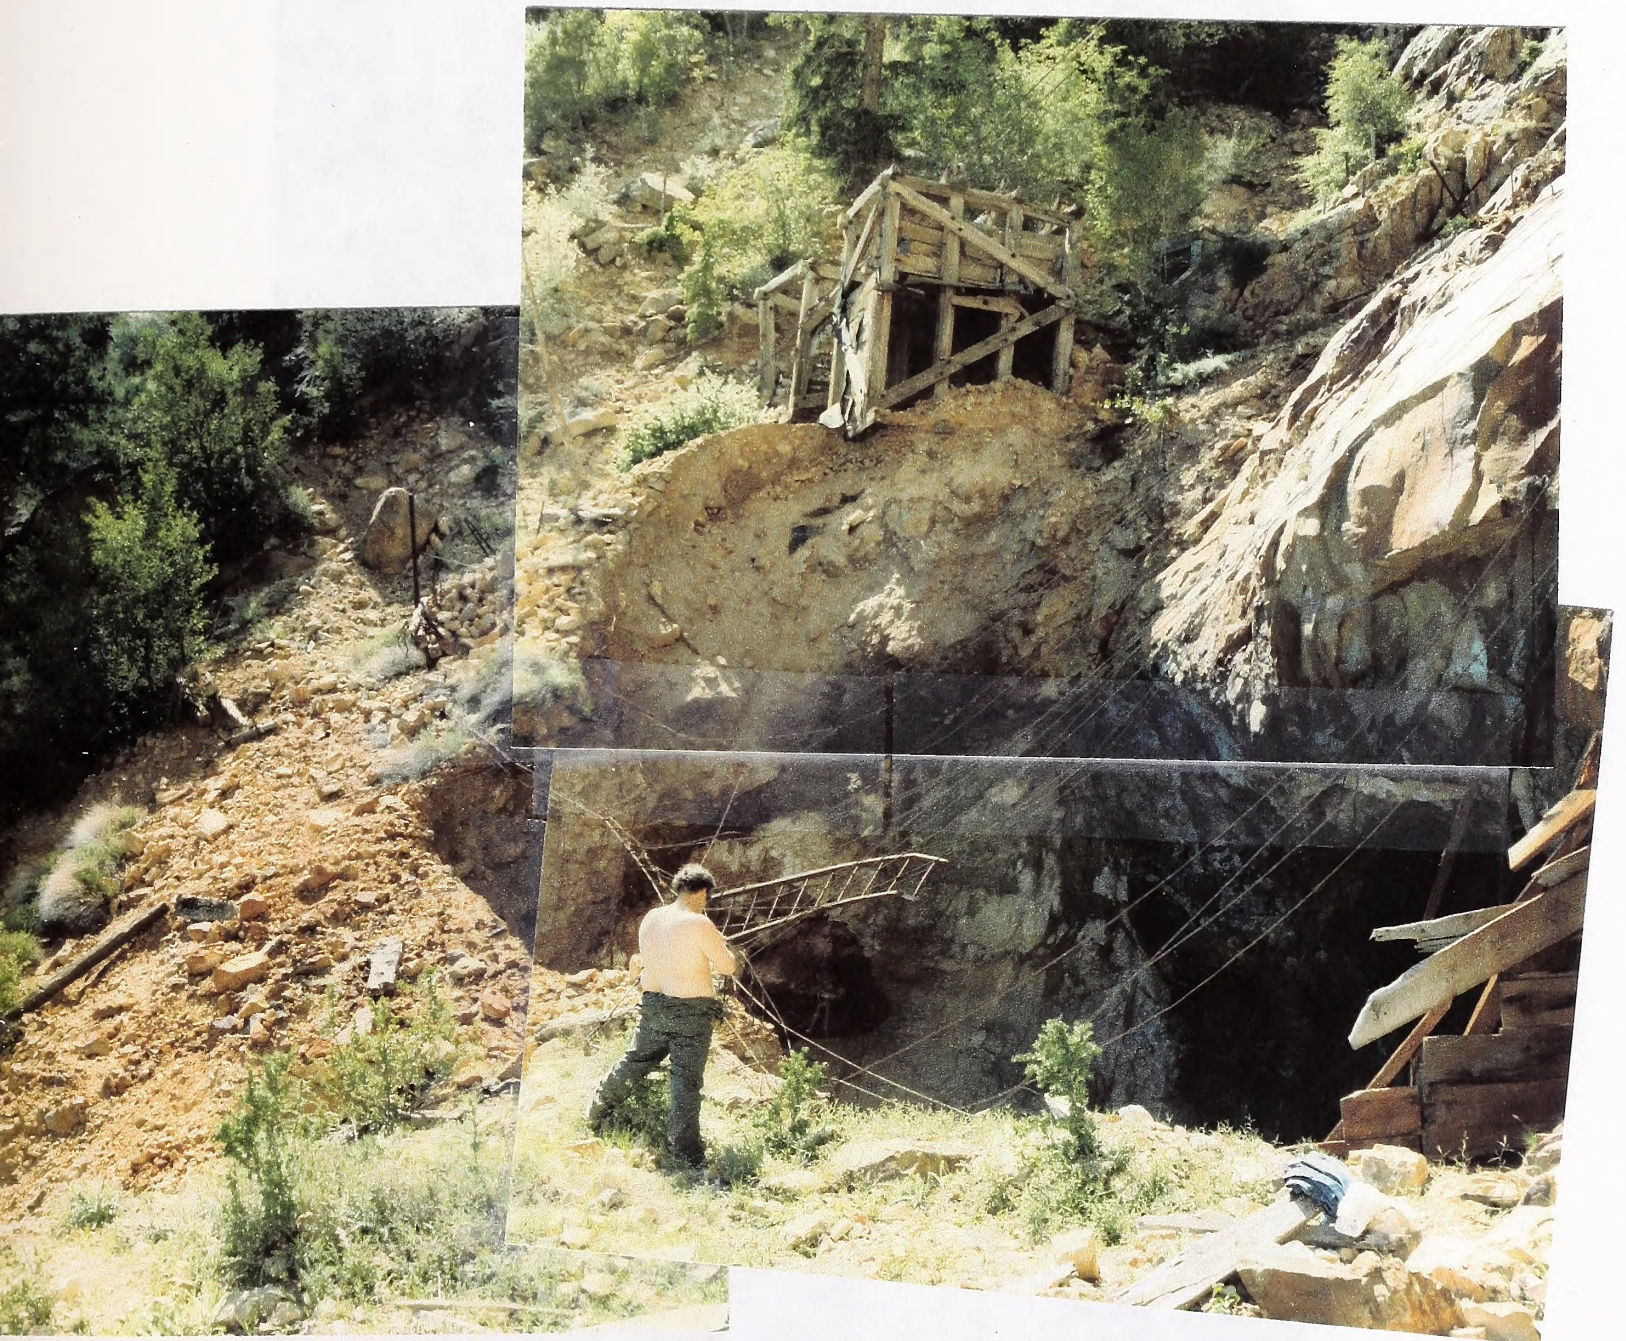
This photo is a closeup view of the open subsidence hole and low aerial tramway tower shown in Photo #4. The cables and wooden planks were an apparent attempt to isolate the open hole from men and equipment in the area.
